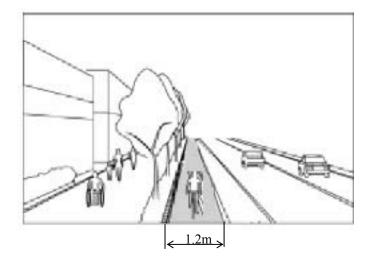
Typical Cross Section (Bicycle Lane on Travelway)
